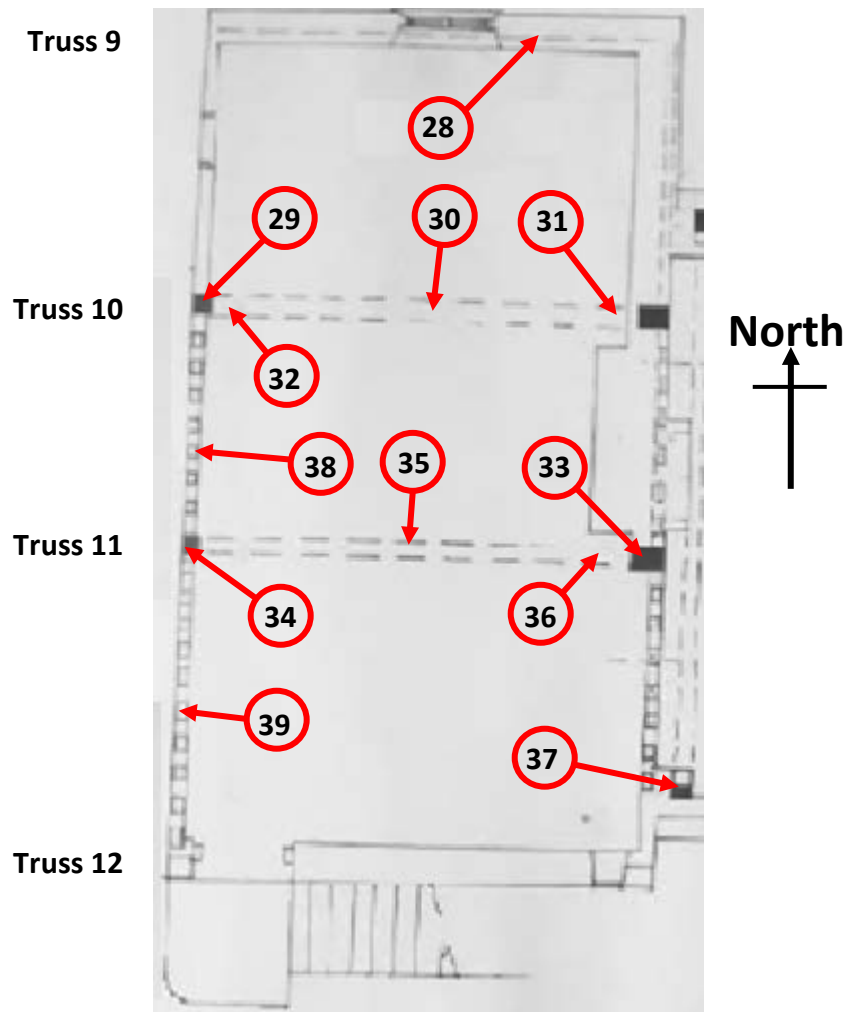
Outline plan of the west cross wing to help locate sampled timbers (after Jones 1994)
